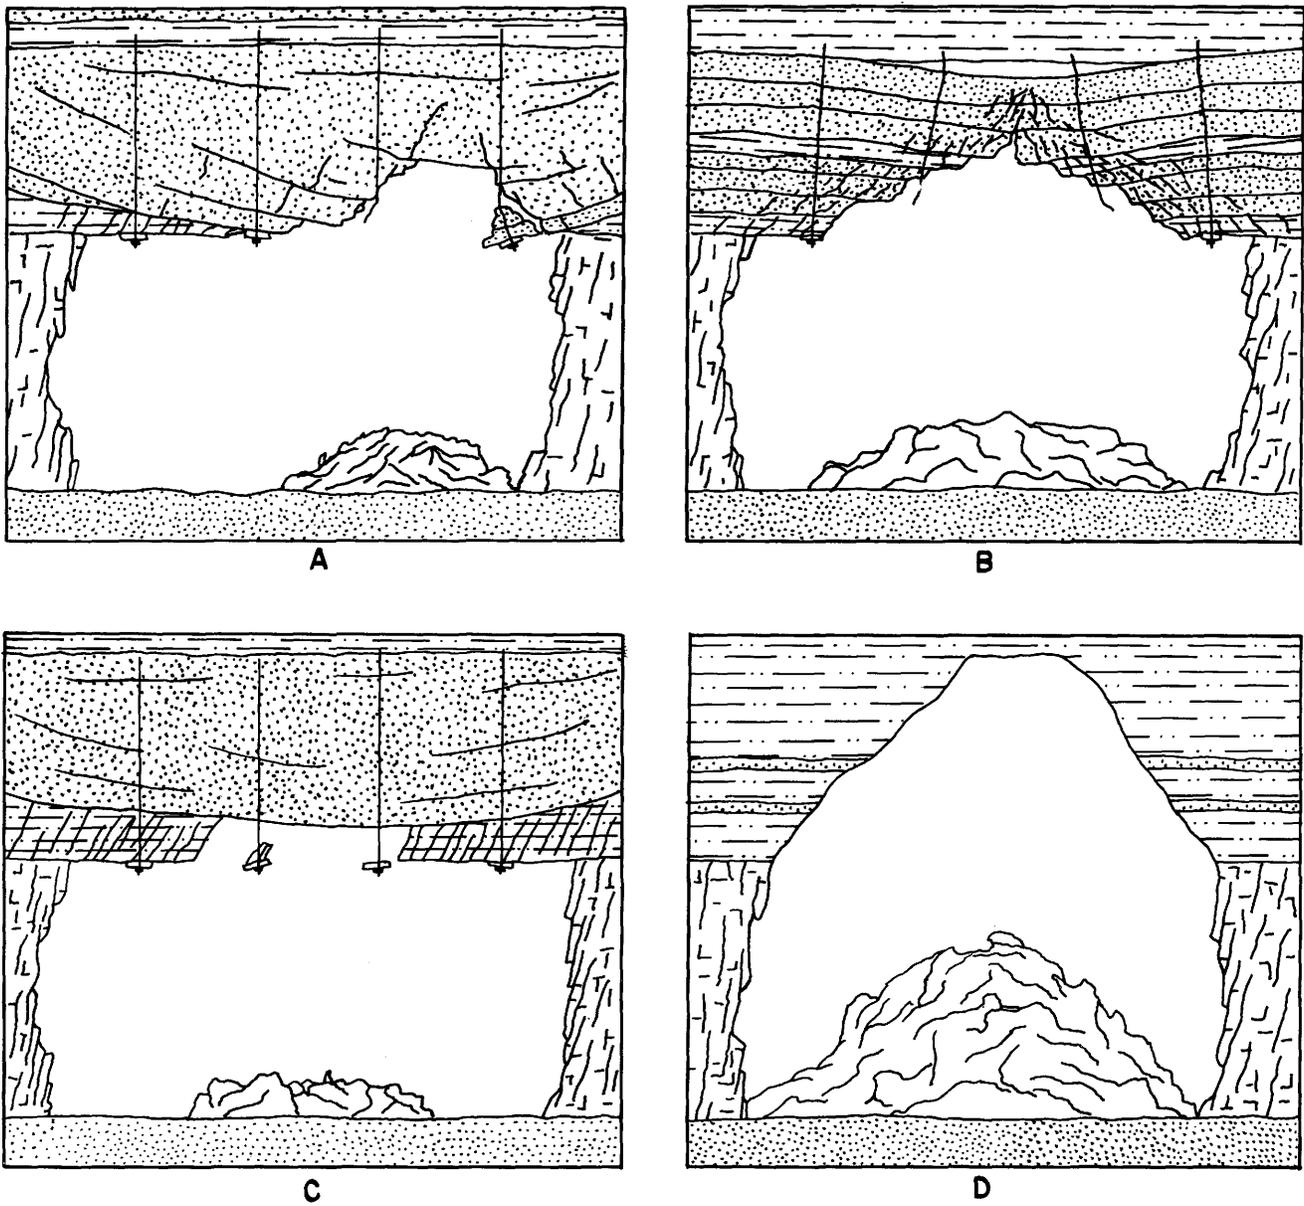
Roof failures in the studied mine, types A through D.
